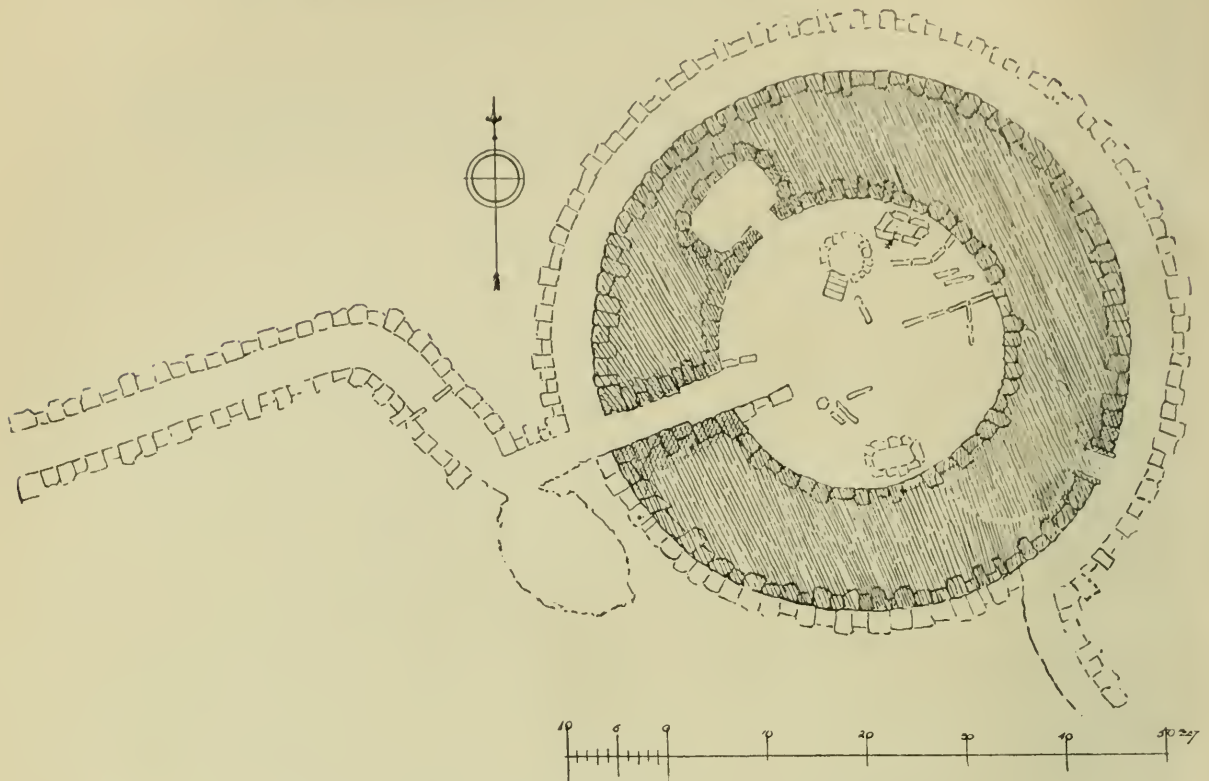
Broch, "Hill of Works" (No. 3); Ground-plan.
